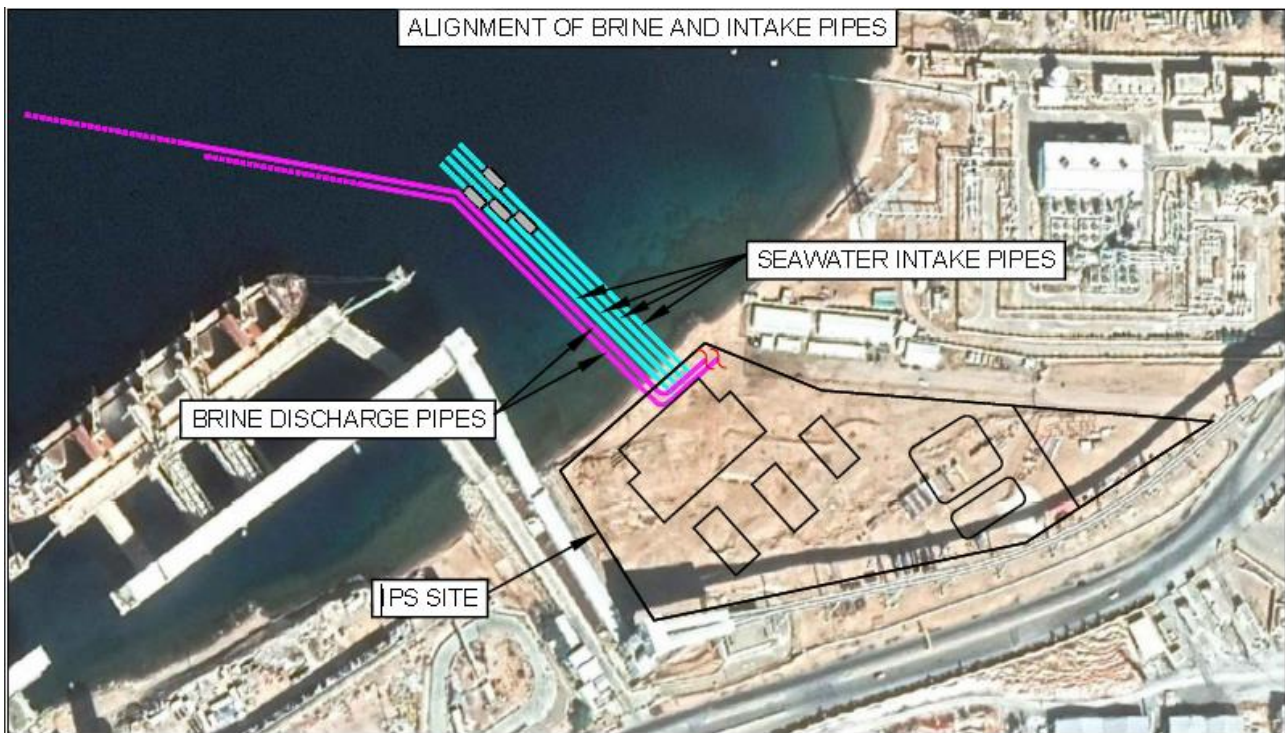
Intake and Outfall Pipelines Routing (Source: Dar/HR Wallingford, 2021)
